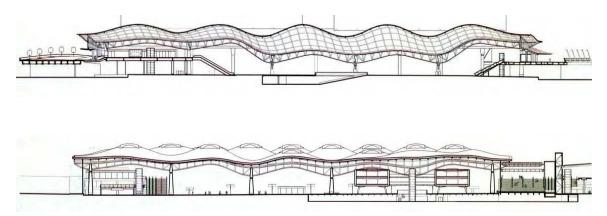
Longitudinal cross sections. Source: (Roke, 2007)
